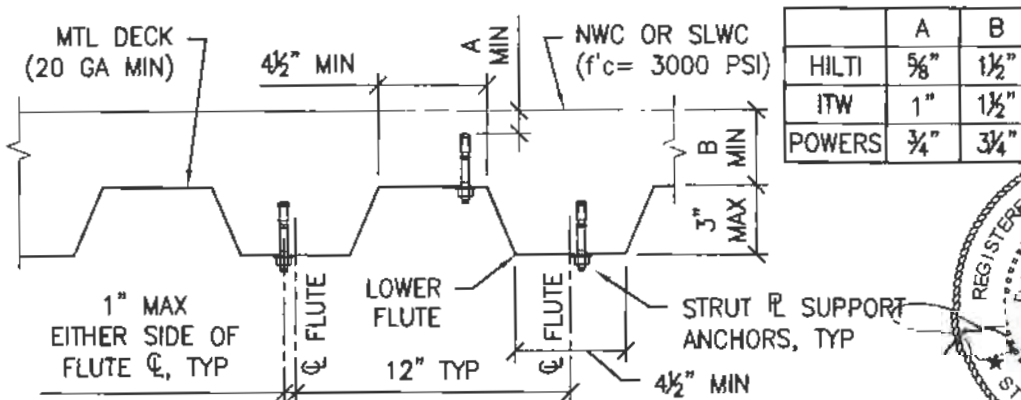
ANCHOR IN SOFFIT OF MTL DECK
